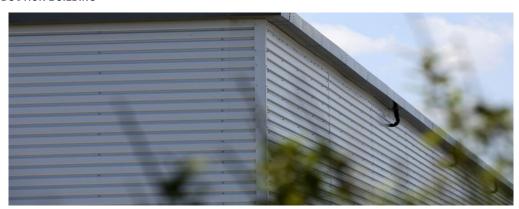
FIG. PRECEDENT IMAGE - HORIZONATALLY LAID GREY TRAPEZOIDAL CLADDING
